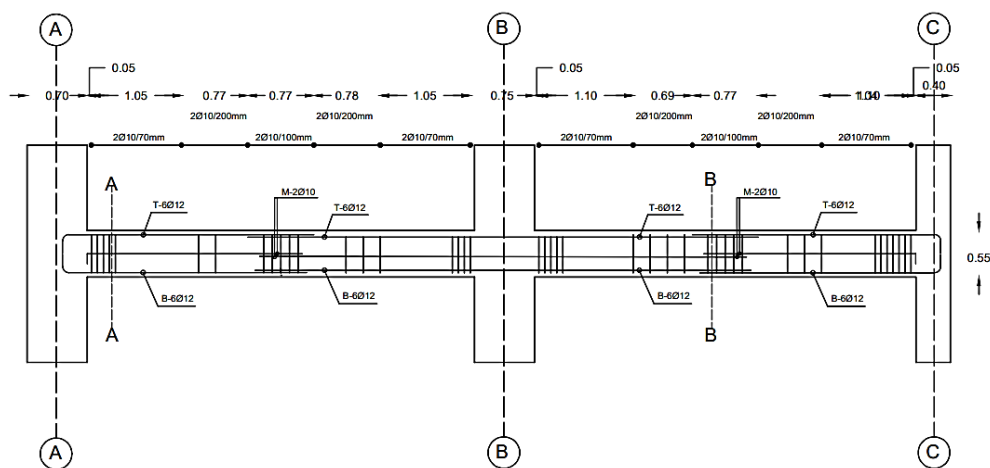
Longitudinal section of beams, B7 & B8.
